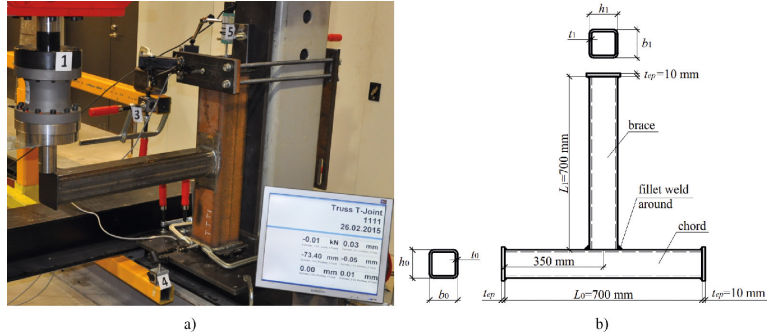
Tests: a) test arrangement; b) specimen dimensions
